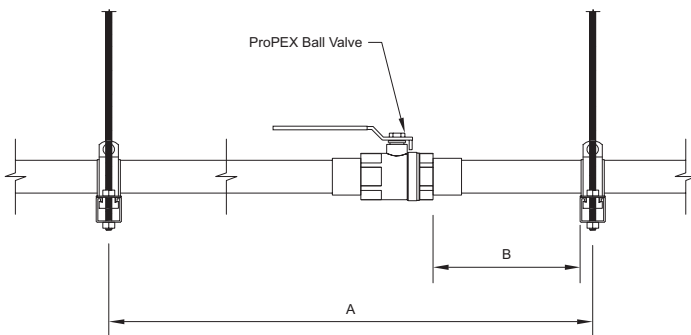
Supporting 1¼" to 2" Ball Valves
